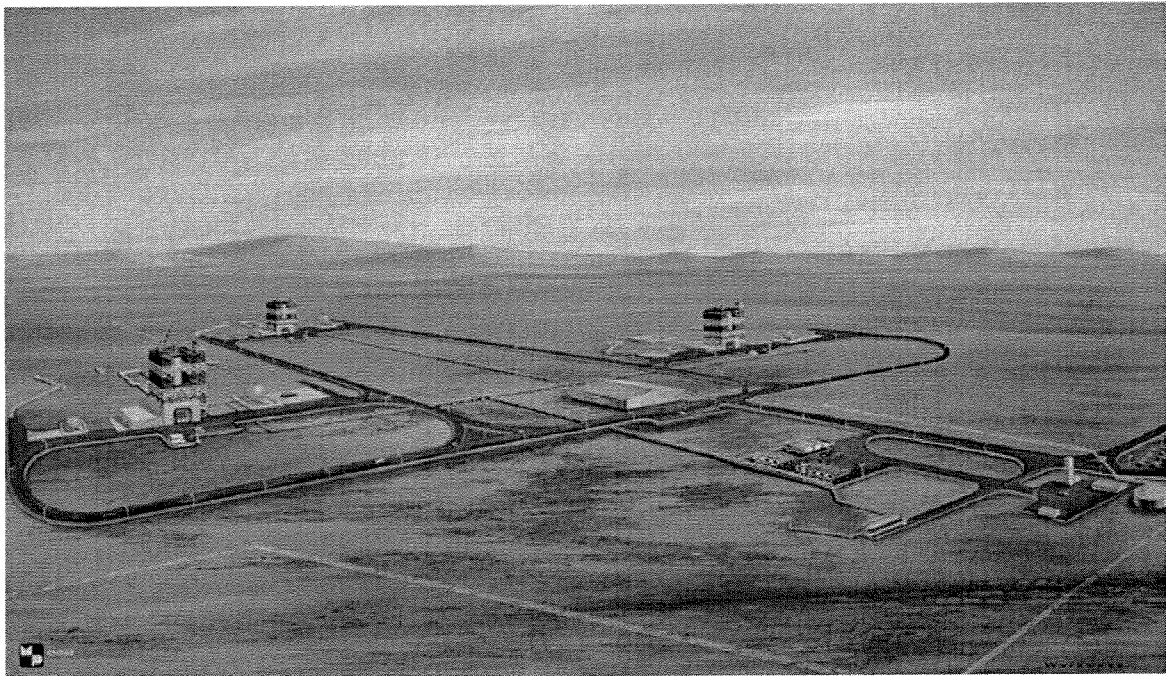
Beta Test Complex, as planned for three test stands, ca.1962-1963. Test control center (blockhouse), center. Test Stand No. 3, left. Test Stand No. 1, right. Facilities shop, calibration tower, pump house, and water tank, right foreground. Courtesy of NASA.
